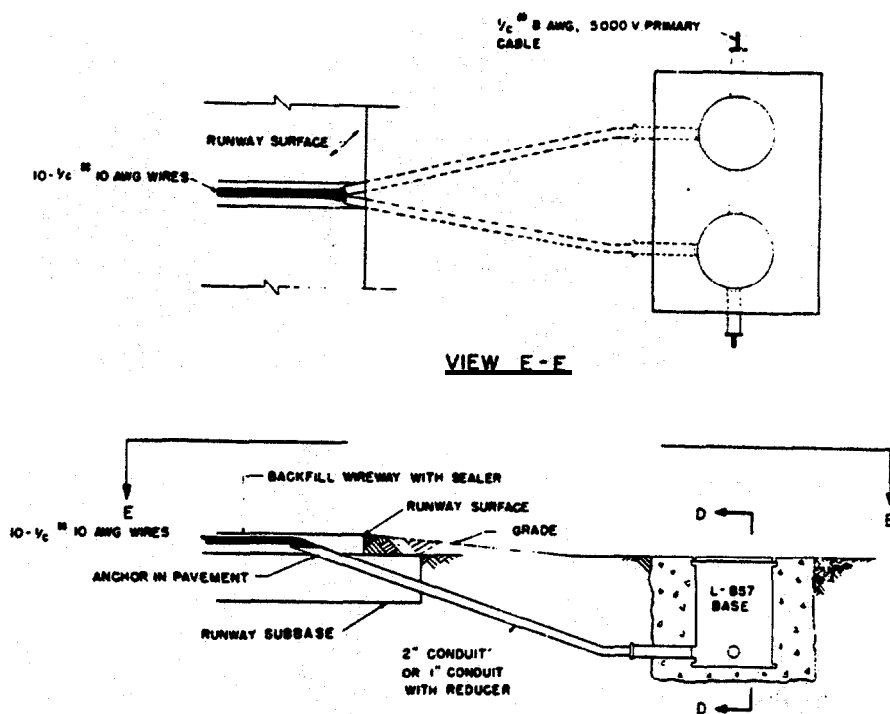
TYPICAL WIREWAY INSTALLATION DETAILS FOR TOUCHDOWN ZONE AND CENTERLINE LIGHTS
